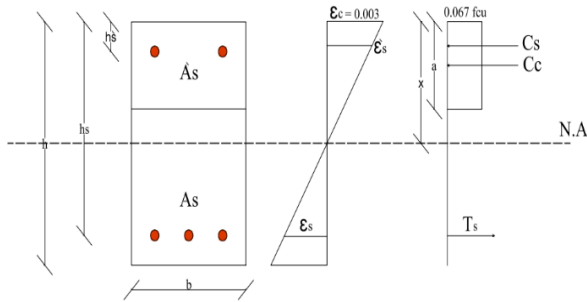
Diagram of the calculation on the cross-section steel rebar.
